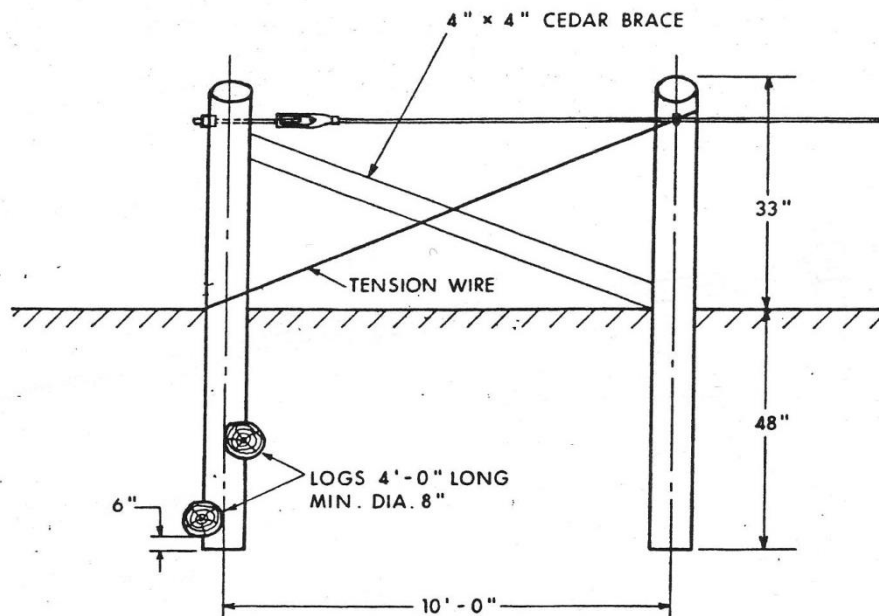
Canadian Department of Highways "Standard" Anchor Details, 1967 [19]
